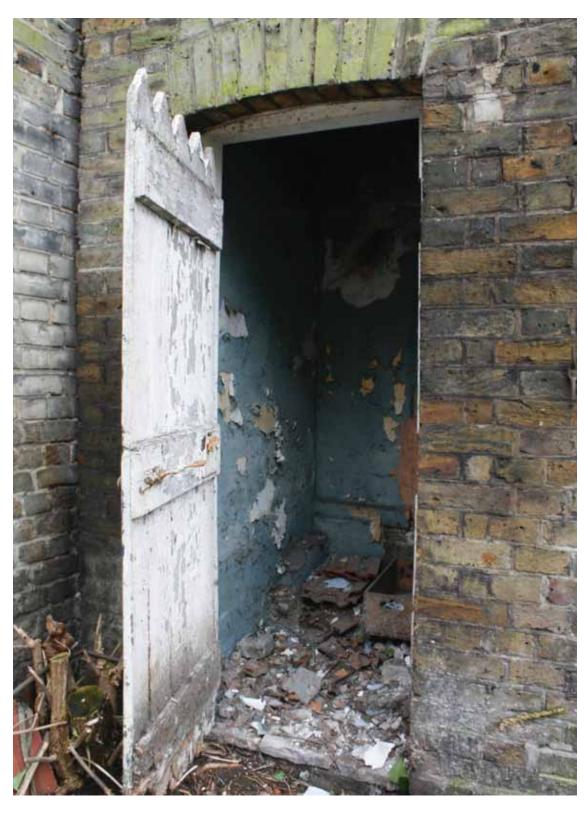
Toilet at the north end of 204, Grange Road, looking south (PCA Archive no. GBR12 D100 (11))
